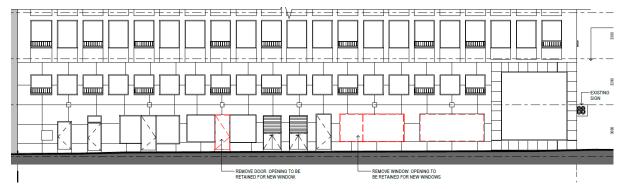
Proposed demolition at ground level of the Hardware Street elevation. From Drawing TP06
